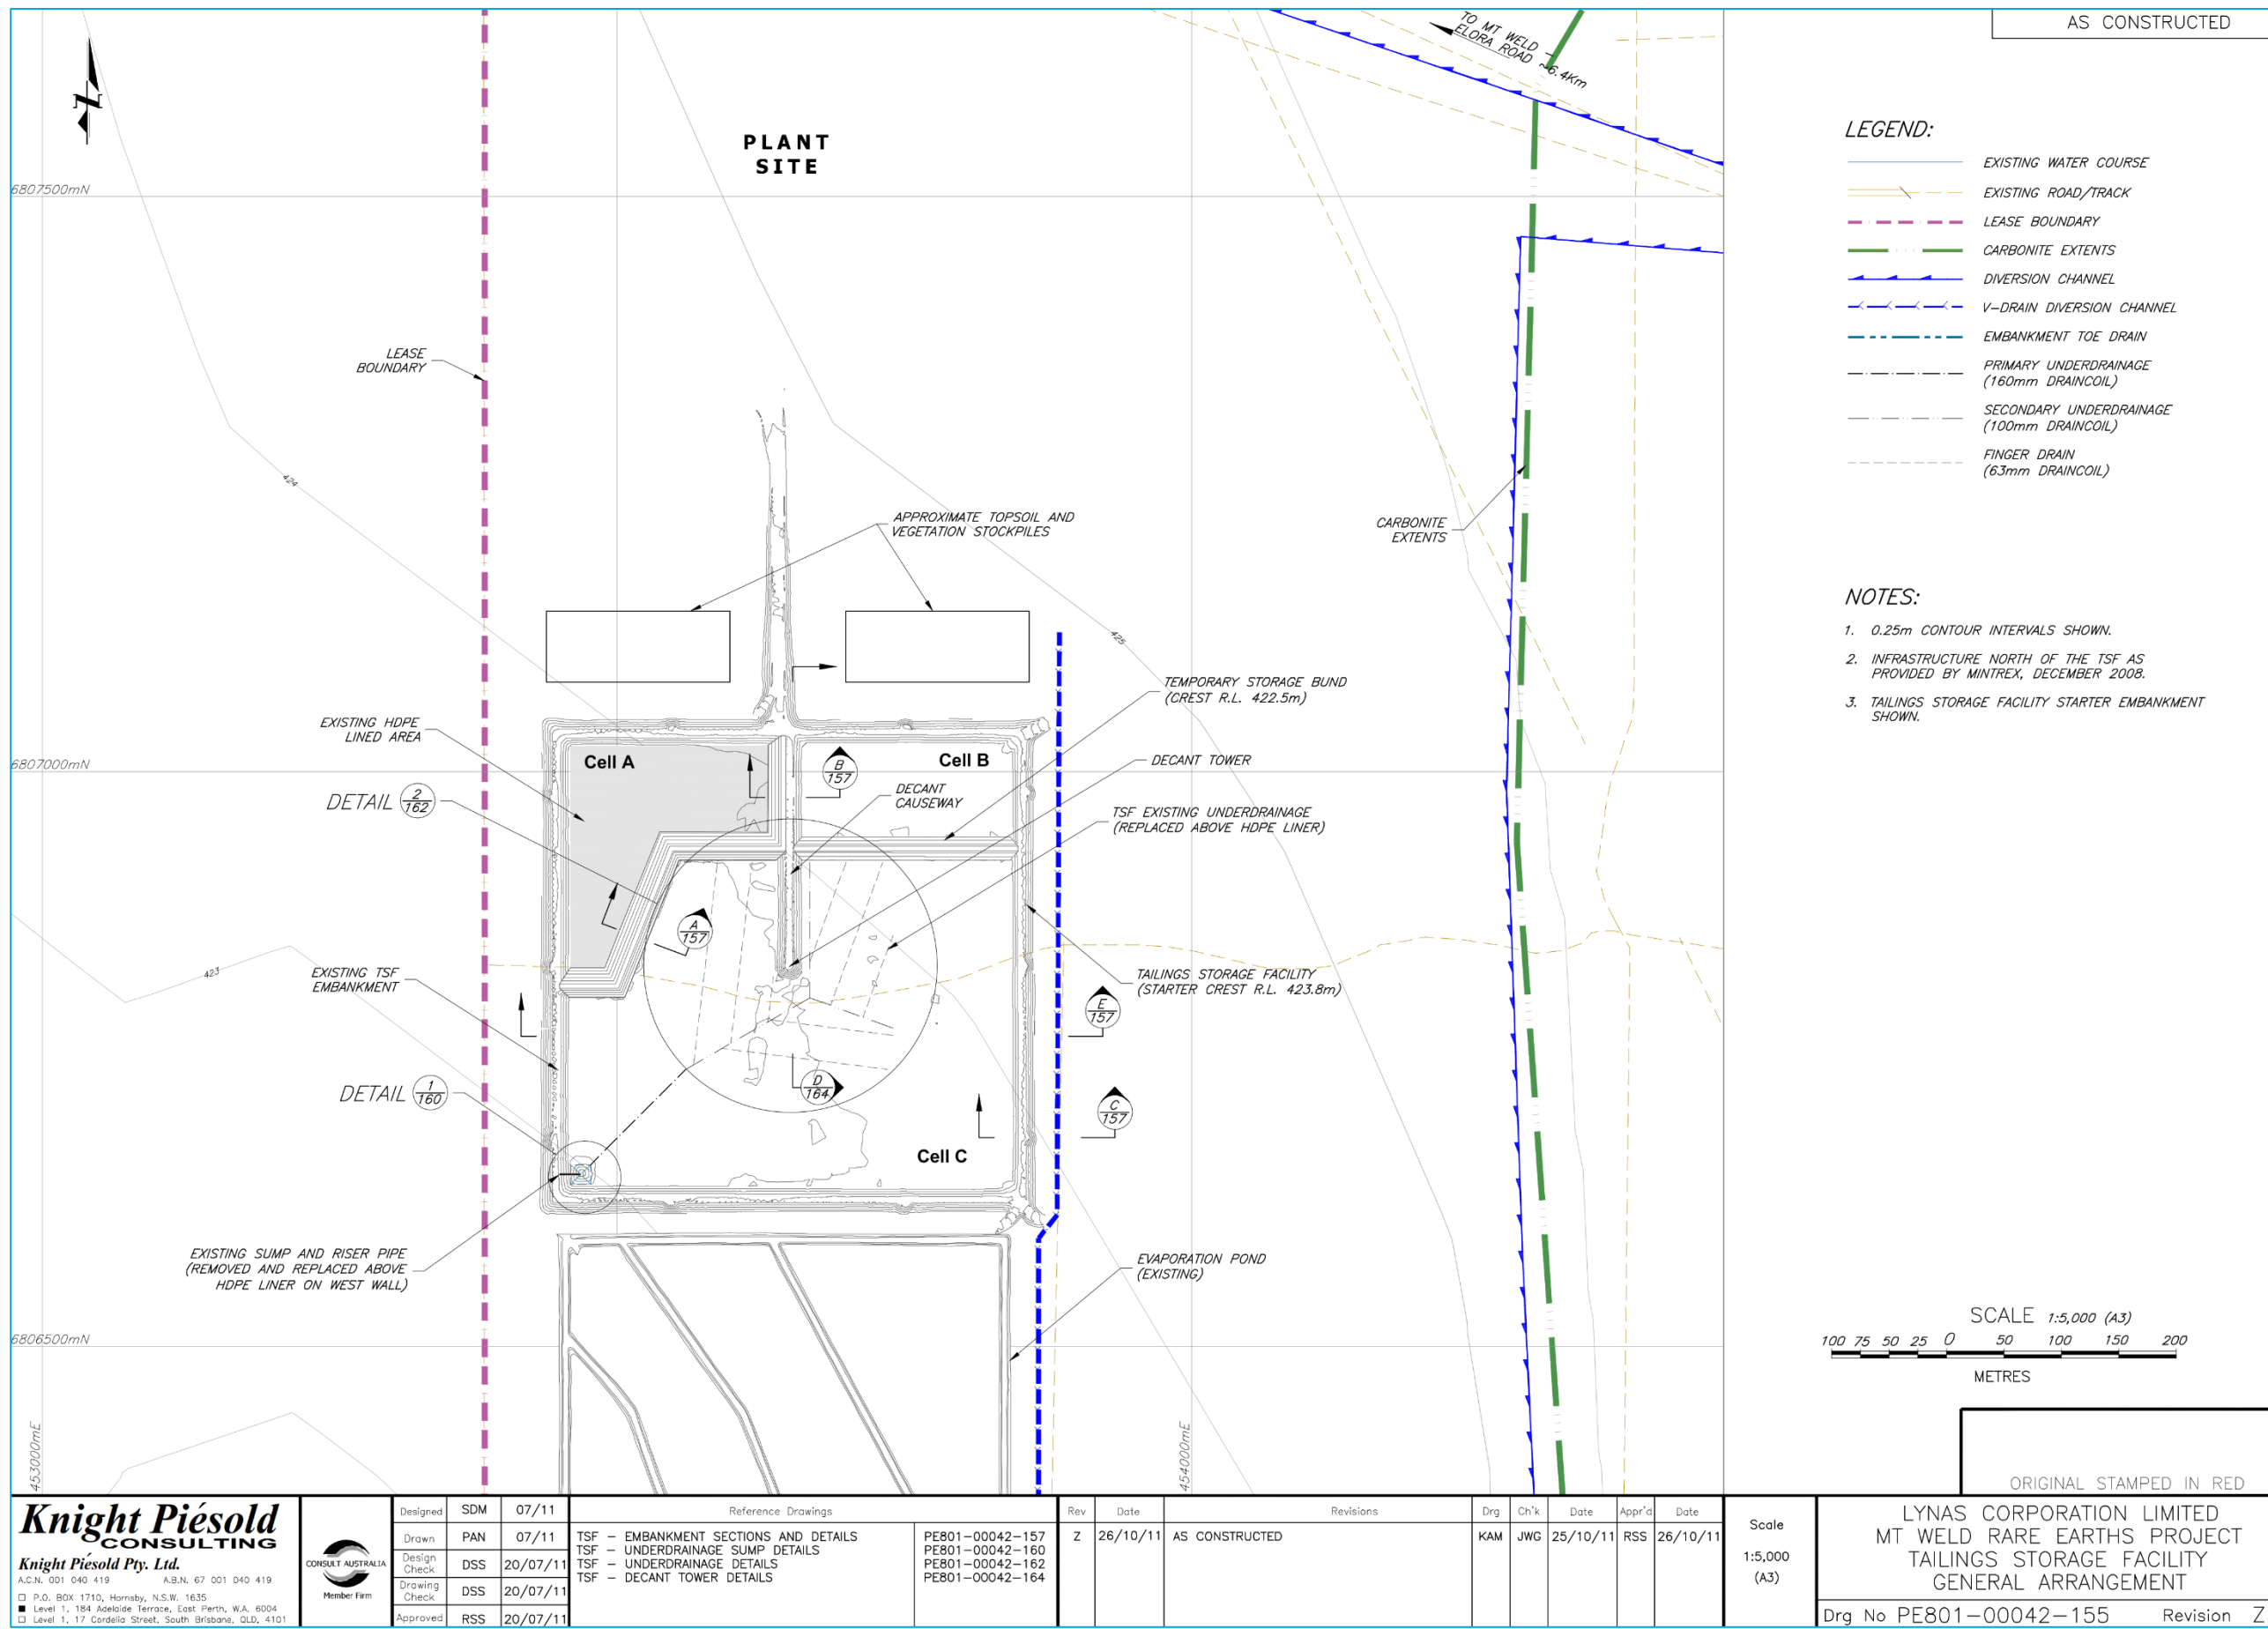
Locality plan for Tailings Storage Facility 1 (Lynas 2014b)
